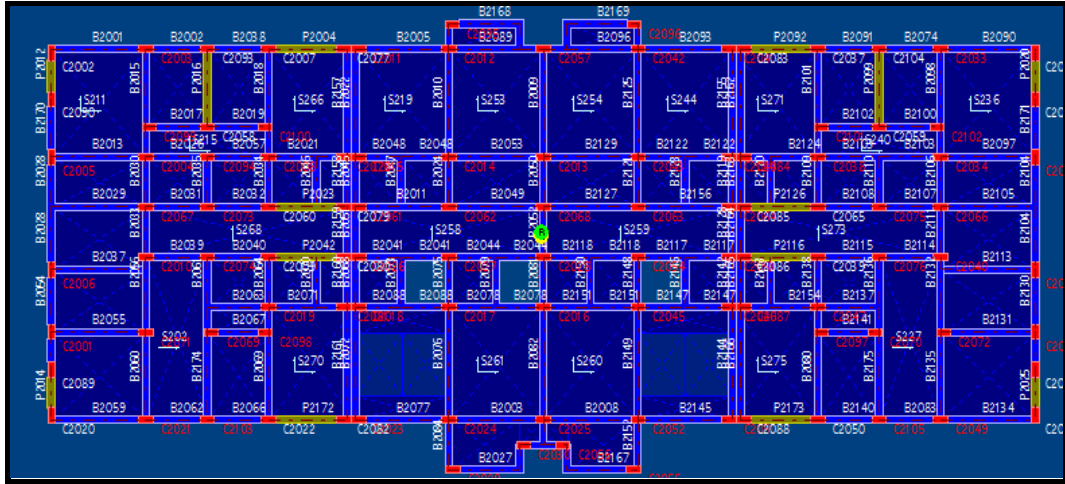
Plan of Twenty Stories and Stiffened Coupled Shear Wall System
